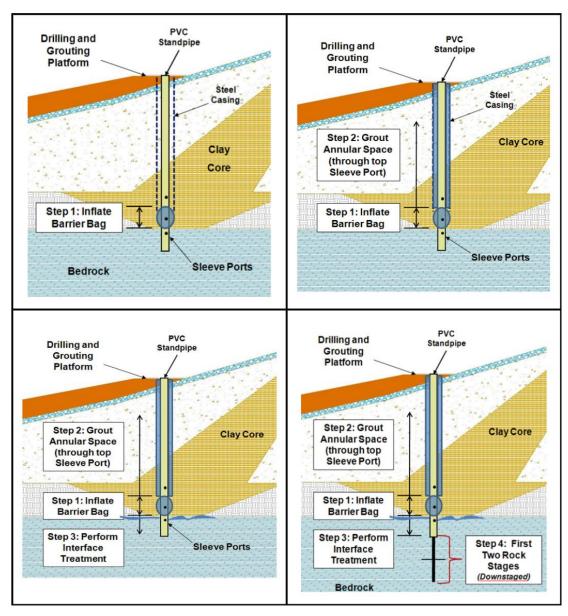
Illustration of standpipe and interface zone grouting using MPSP system (from Stare et al. [9], with permission from the American Society of Civil Engineers).
